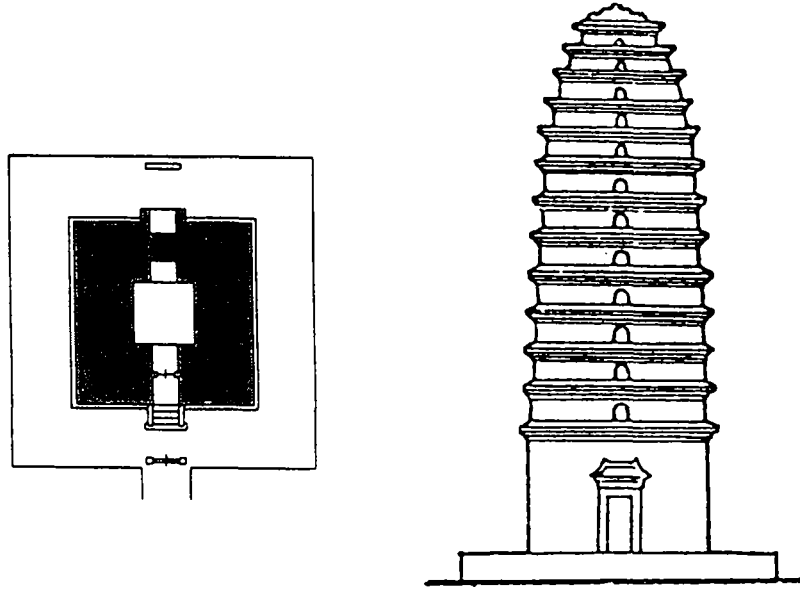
Ground plan and elevation of the Xiaoyan-ta 大雁塔 대안탑 of Jianfu-si 慈恩寺 자은사 near Xi'an 西安 서안 (707 - 709 AD, scale: 1 : 500)
